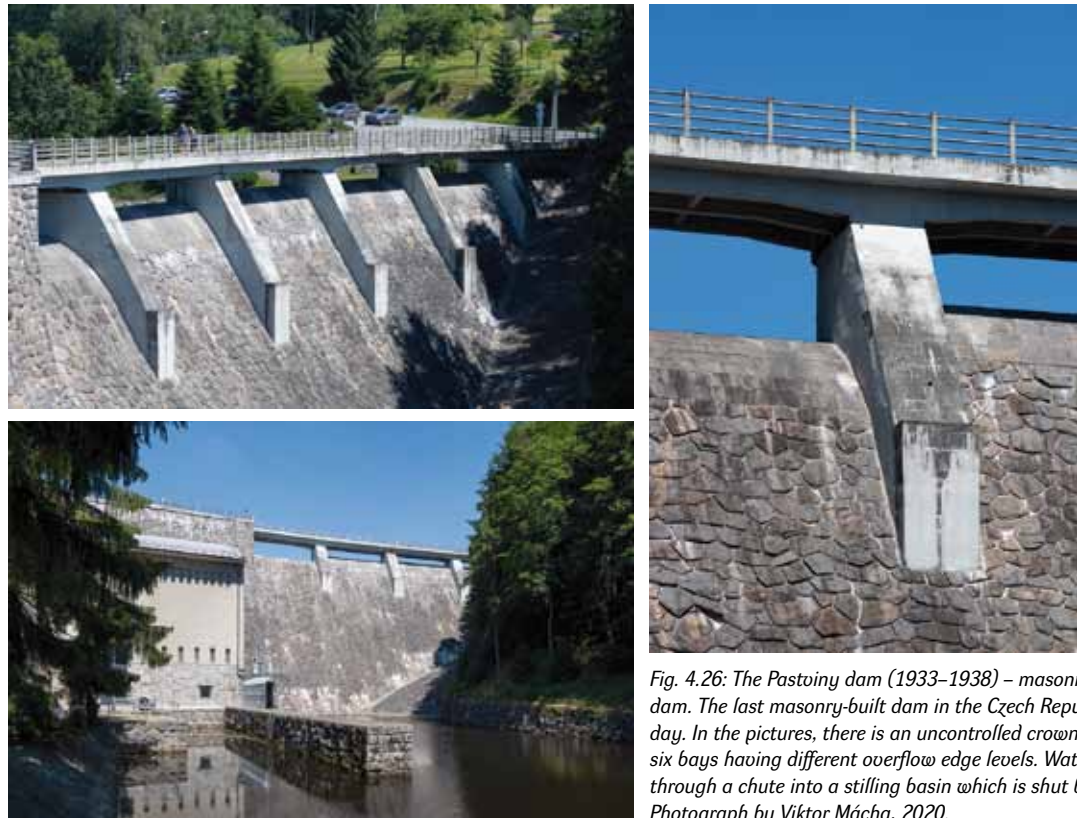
The Pastviny dam (1933–1938) – masonry gravity dam. The last masonry-built dam in the Czech Republic to this day. In the pictures, there is an uncontrolled crown spillway with six bays having different overflow edge levels. Water is diverted through a chute into a stilling basin which is shut by a stepped sill. Photograph by Viktor Mácha, 2020.
